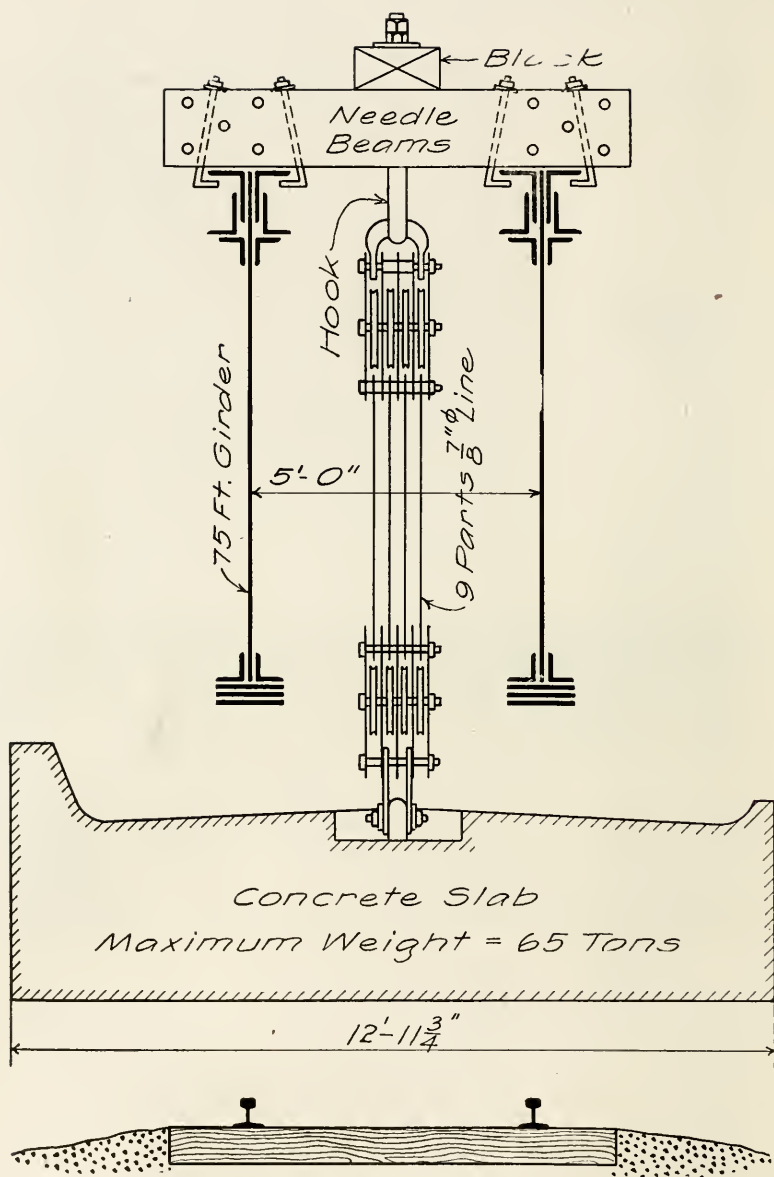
ELEVATION OF SLAB ERECTING TRAIN.
